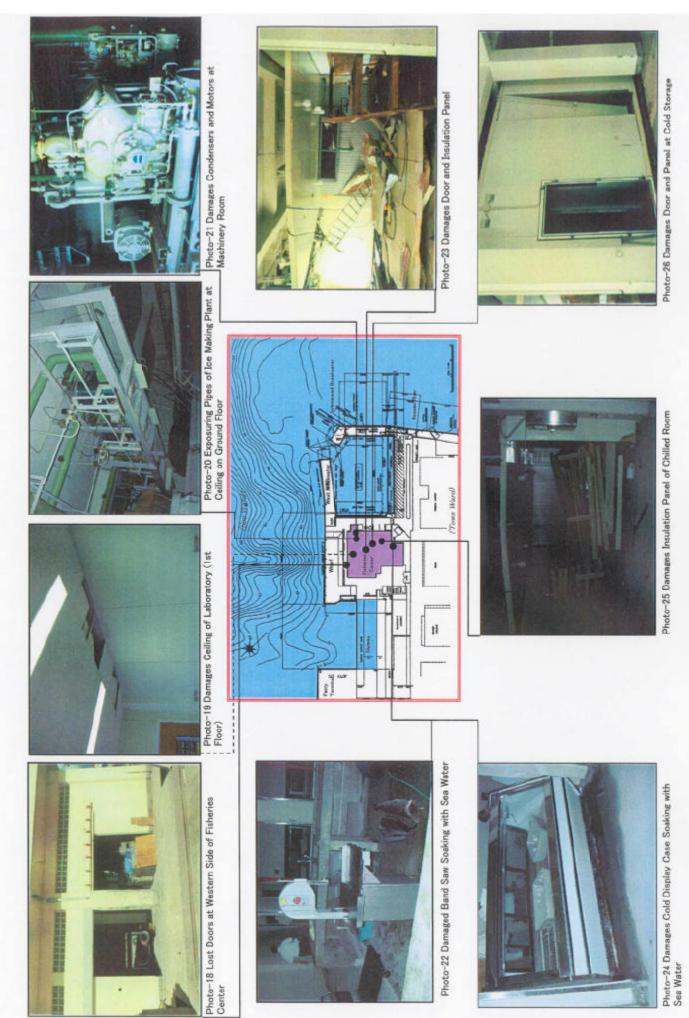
(4) Damages of Facilities Fisheries Center
